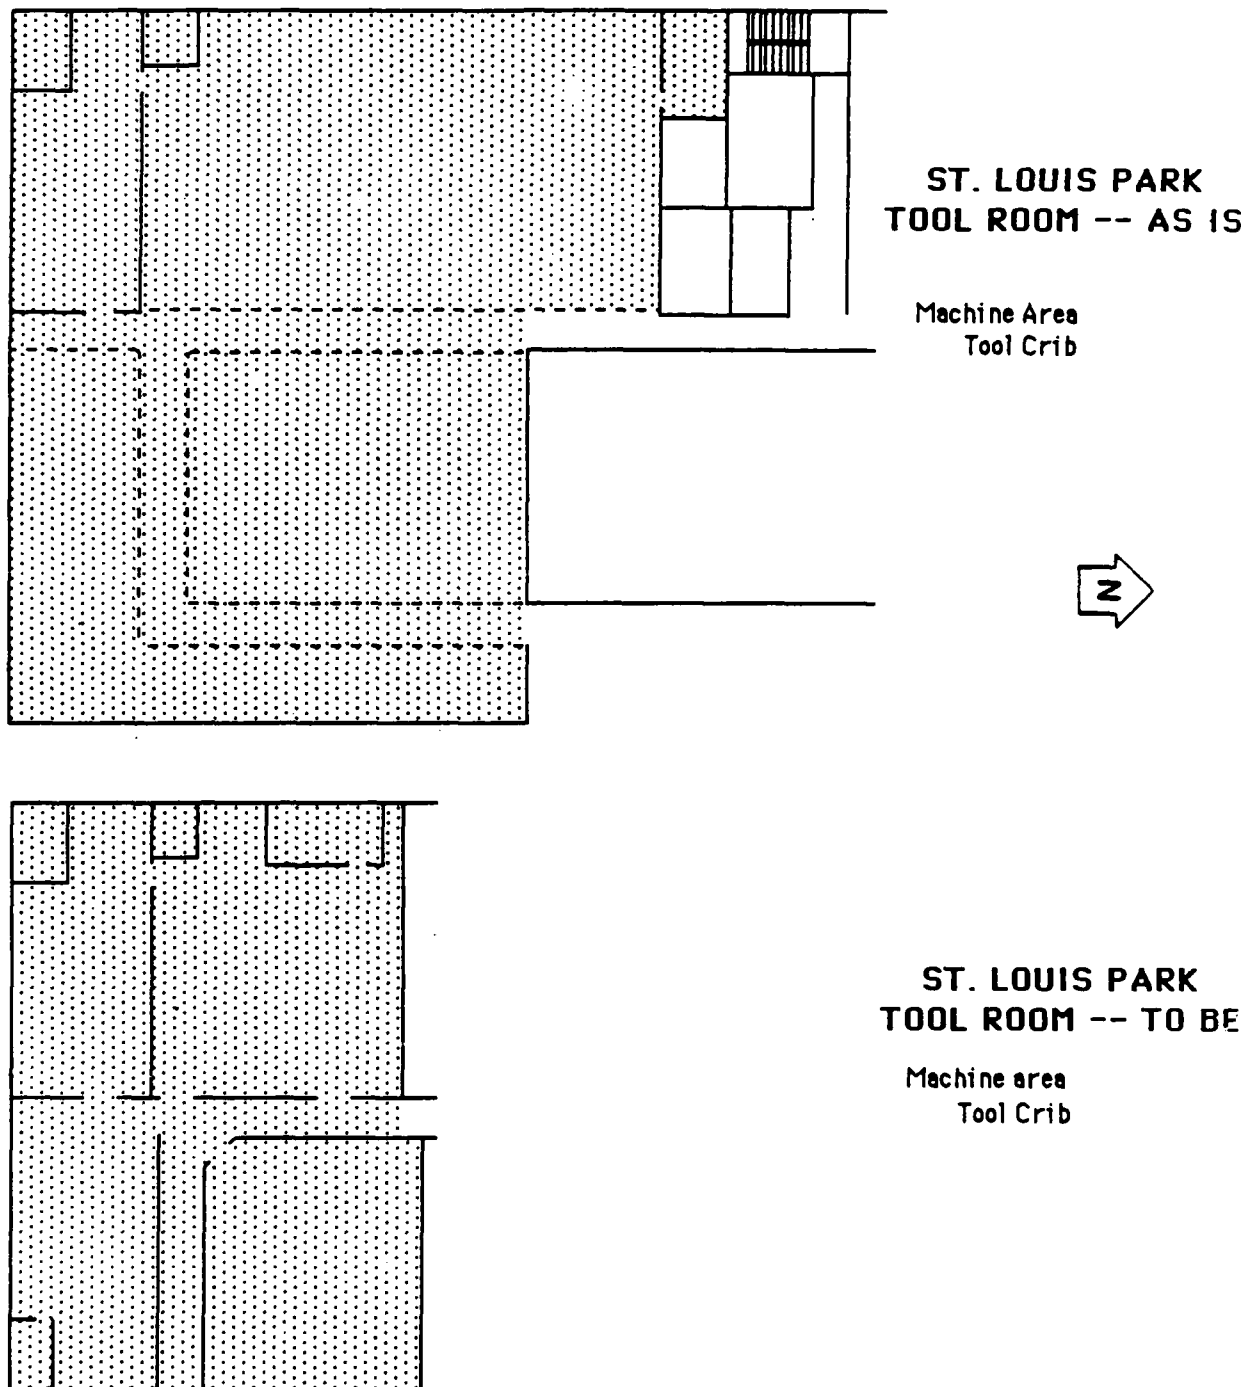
"To-Be" St. Louis Park Tool Room Layout (Comparative Area)
